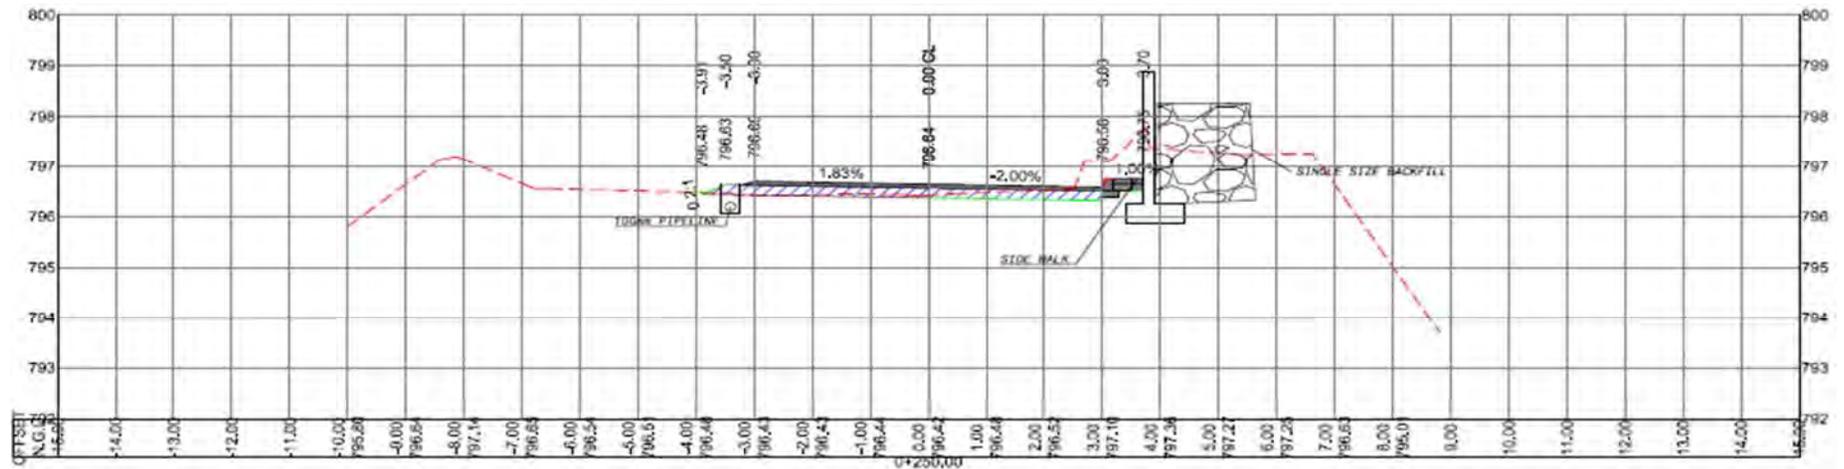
Segment A -As Built Cross Section at Sta.0+250
